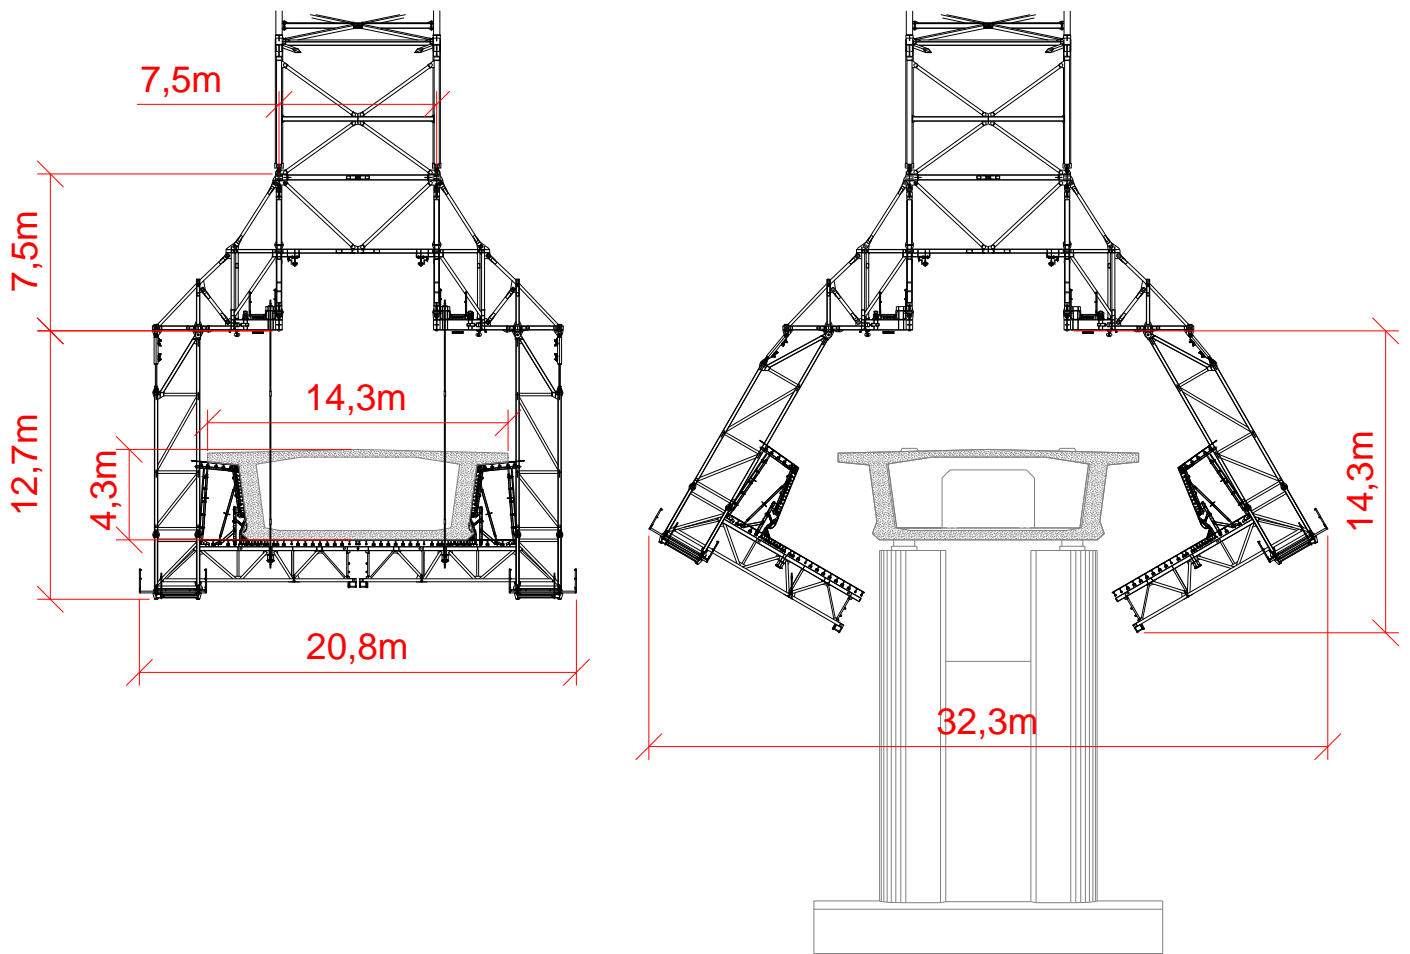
Transversal section of M1-70-S: Concrete Pouring (left) and Launching Configuration (right)
